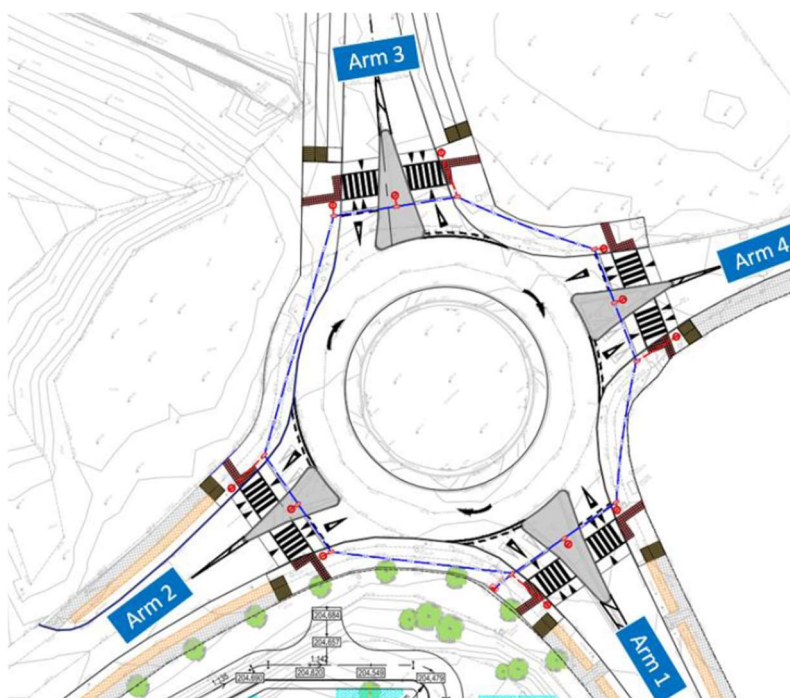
Junction 3 Blessington Relief Road / Oak Drive Roundabout
